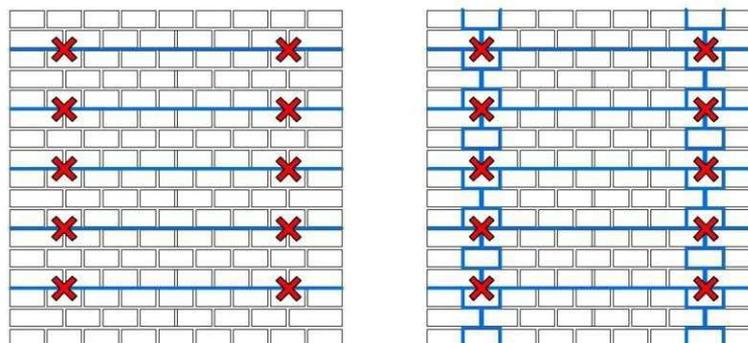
The reinforcing technique for a masonry wall panel (blue lines: steel cords, red crosses: through connectors).
